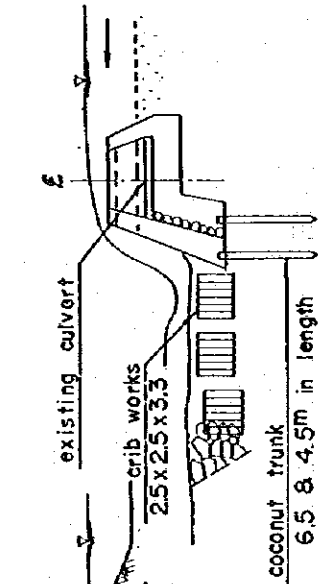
(d) CONSOLIDATION DAM AT THE SITE OF OVERFLOW CULVERT
